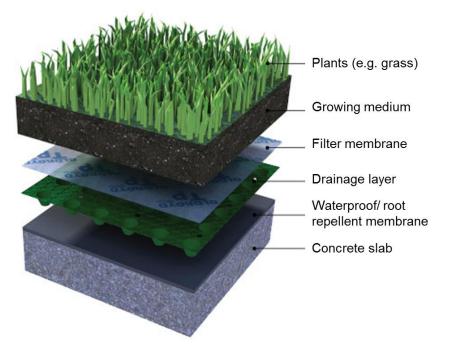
4 Cross-sectional profile of a typical green roof system. Source: Image adapted from safegaurdeurope.com
